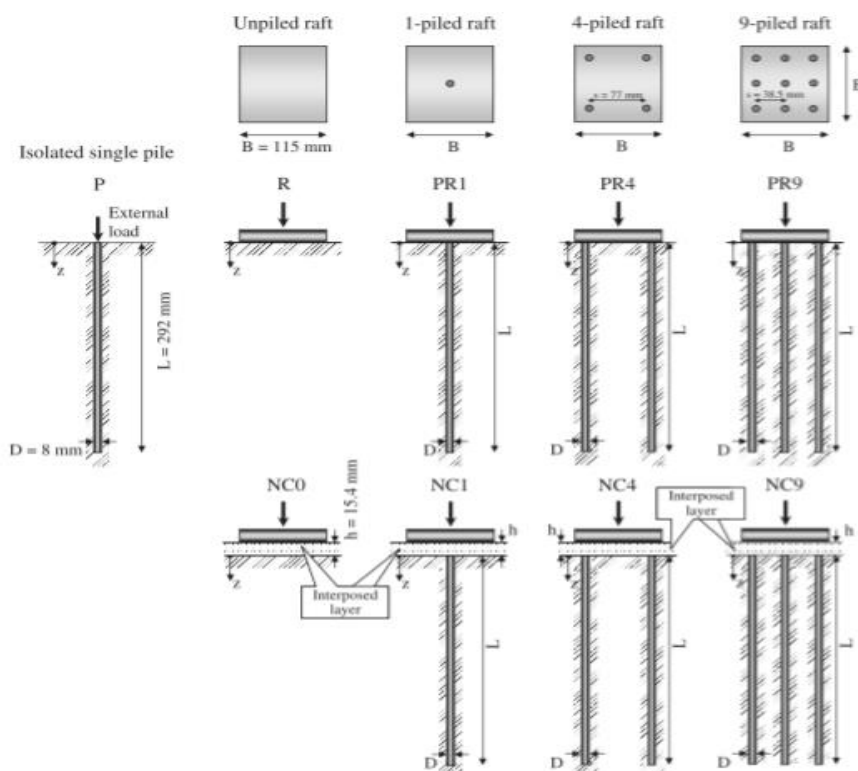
Setups of connected (PR) and non-connected (NC) piled rafts studied by Fioravante and Giretti
